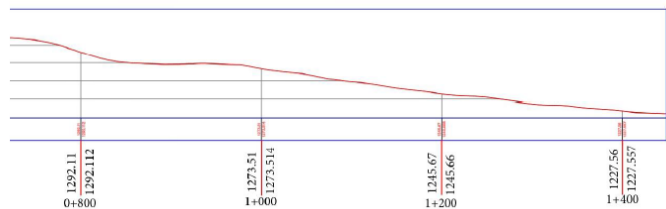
Longitudinal Section of the Existing Road (STA 0+800 – STA 1+400)
